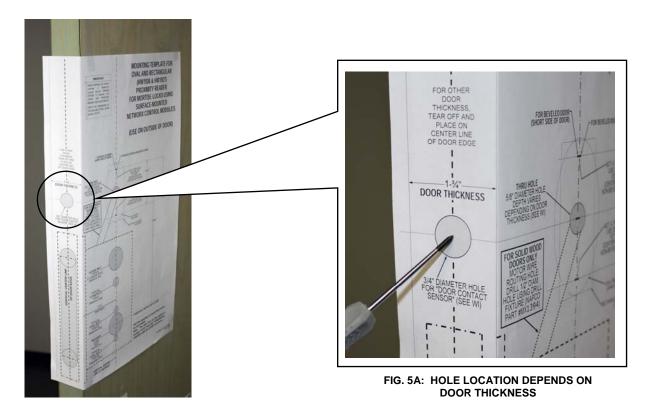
DOOR CONTACT SENSOR HOLE ON DOOR EDGE
